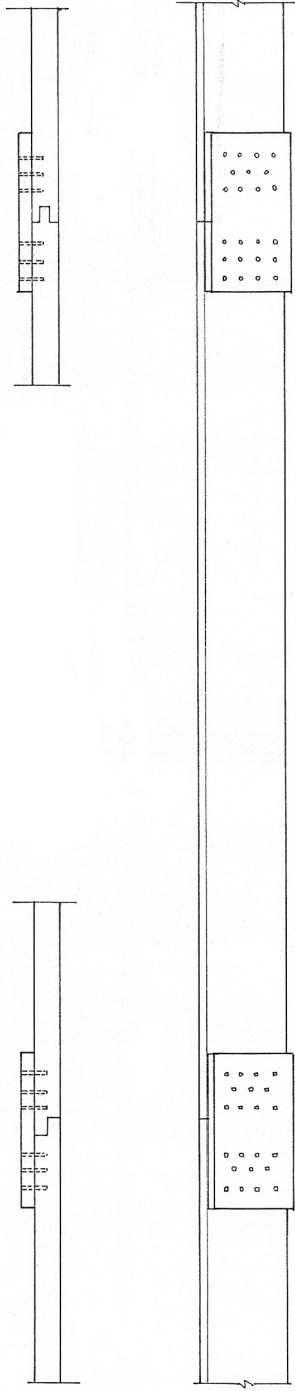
Butt joints (lap joint and tongue and groove joint) tightened by butt straps, also called butt plates. (Courtesy of National Maritime Museum of Korea)
